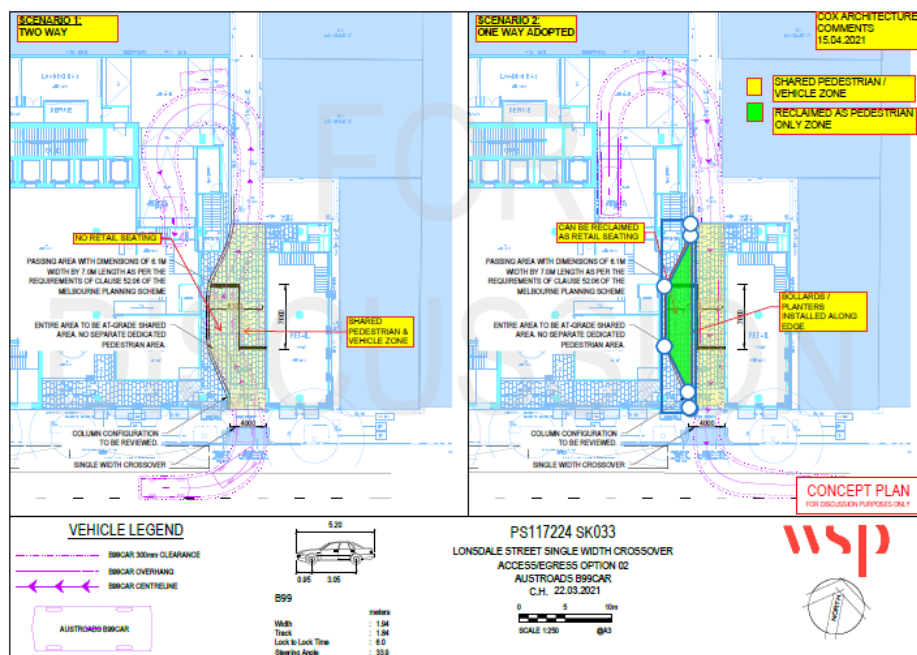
Indicative plans 20 April 2021 (Source: Applicant)
